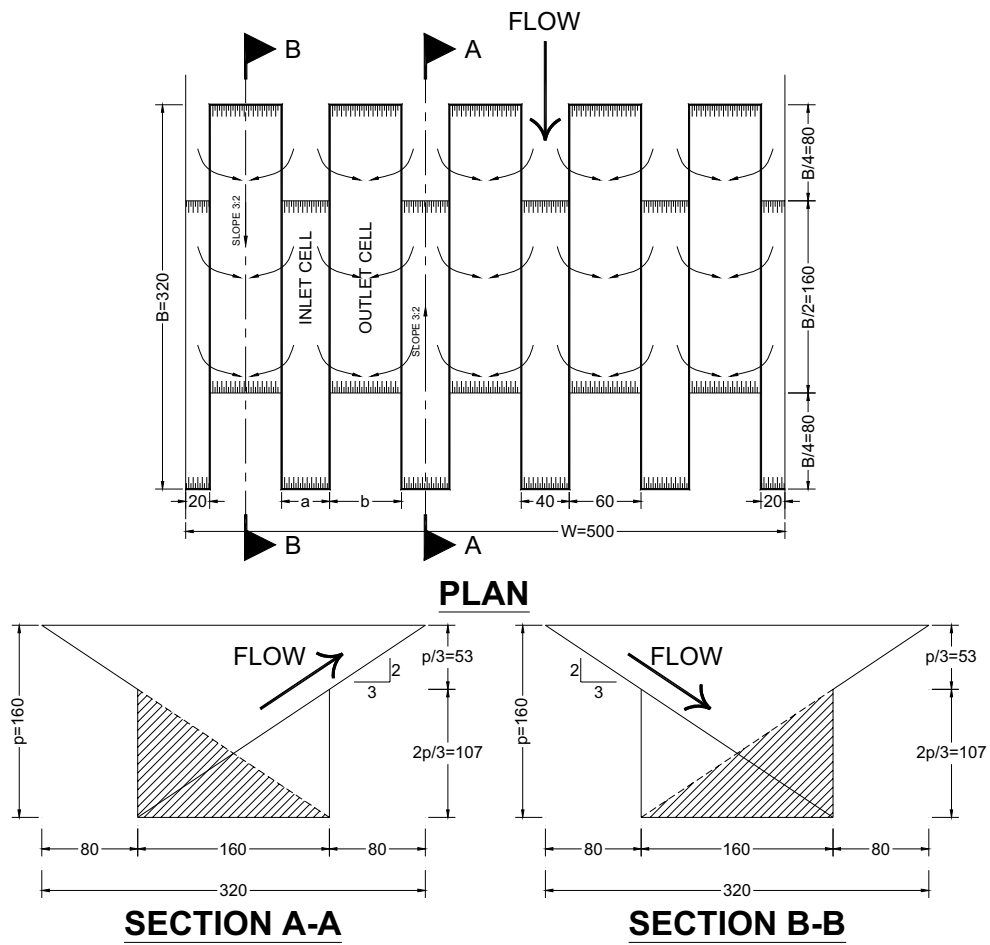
Plan and section of model P_3M_2 (both sides ramping), (dimensions in mm)
